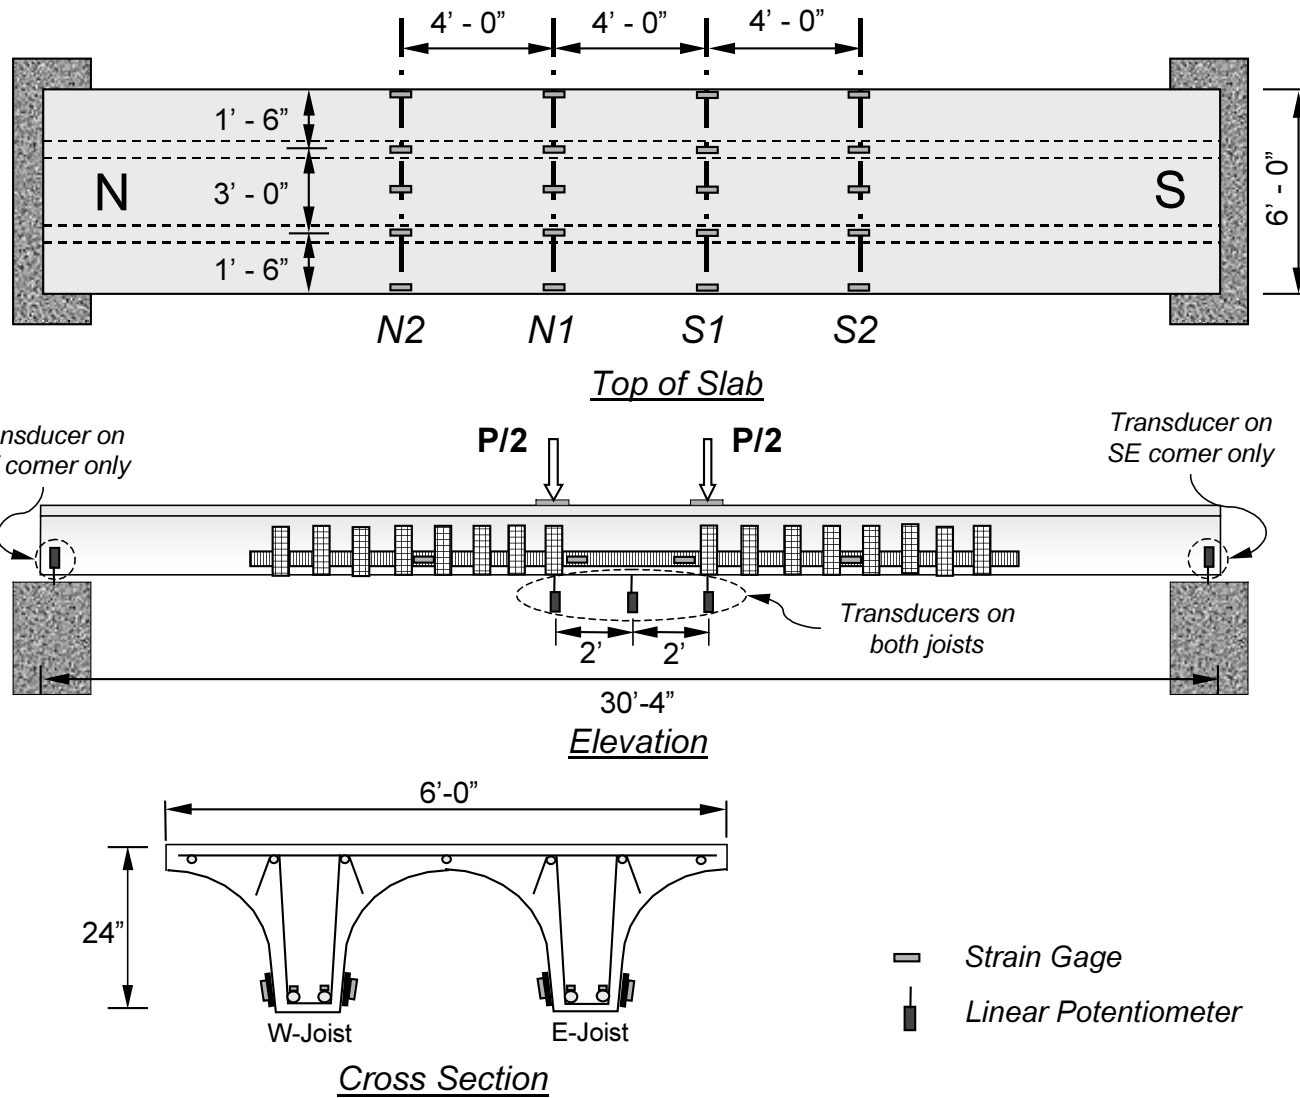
Location of Instrumented Sections Showing Position of Potentiometers and Strain Gages in Specimen J-1
